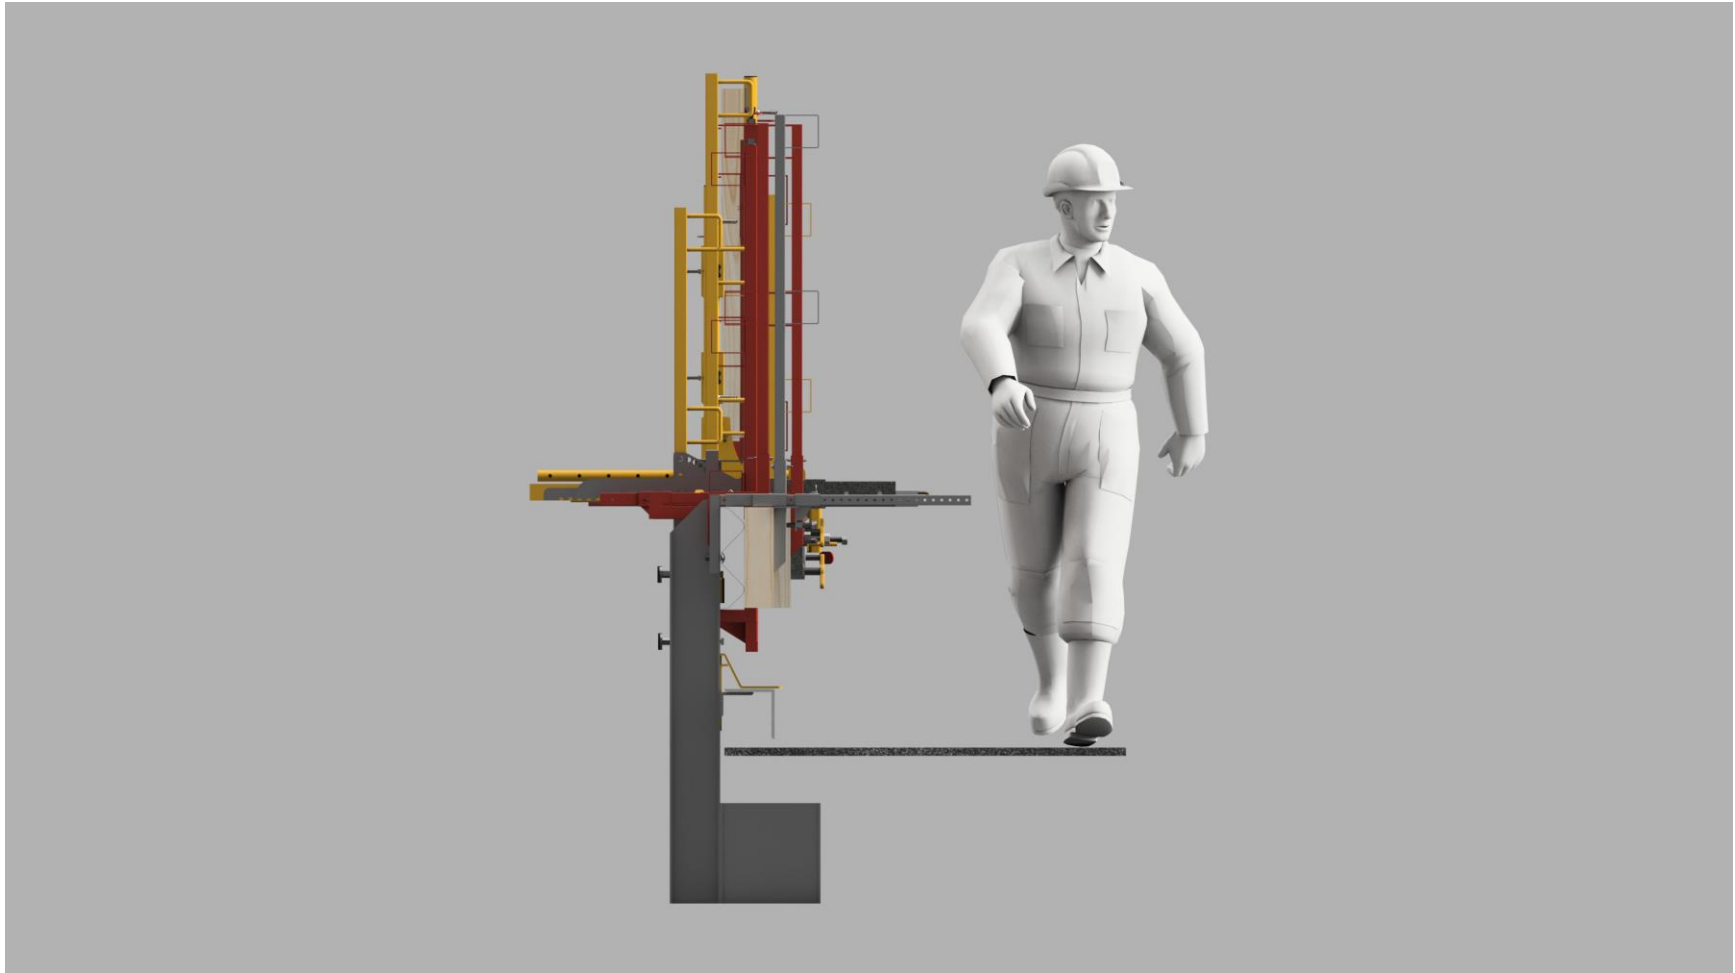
Guardrail Type 23, guardrail fit; view from the south
